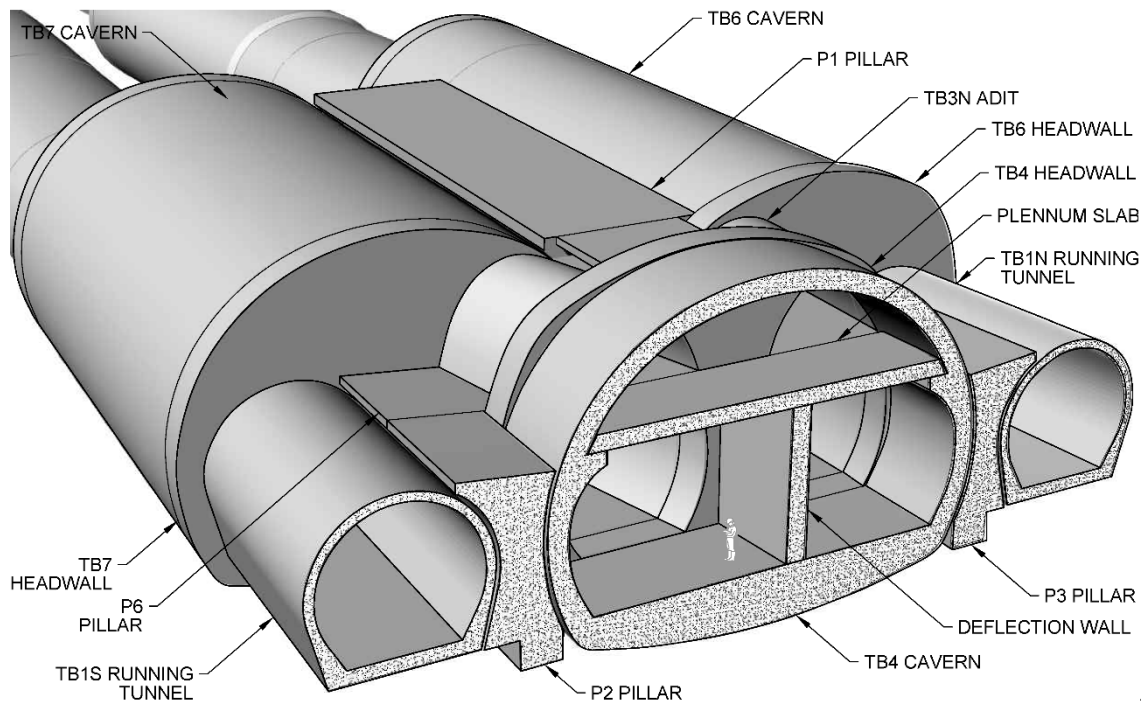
Perspective view of the caverns, headwalls, and adits required where the configuration changes from two adjacent caverns to a single cavern flanked by running tunnels.
